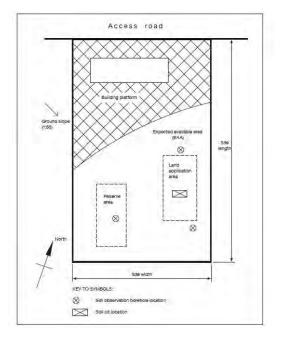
Generalised site plan for a single lot (AS/AZS 1547: 2012)
